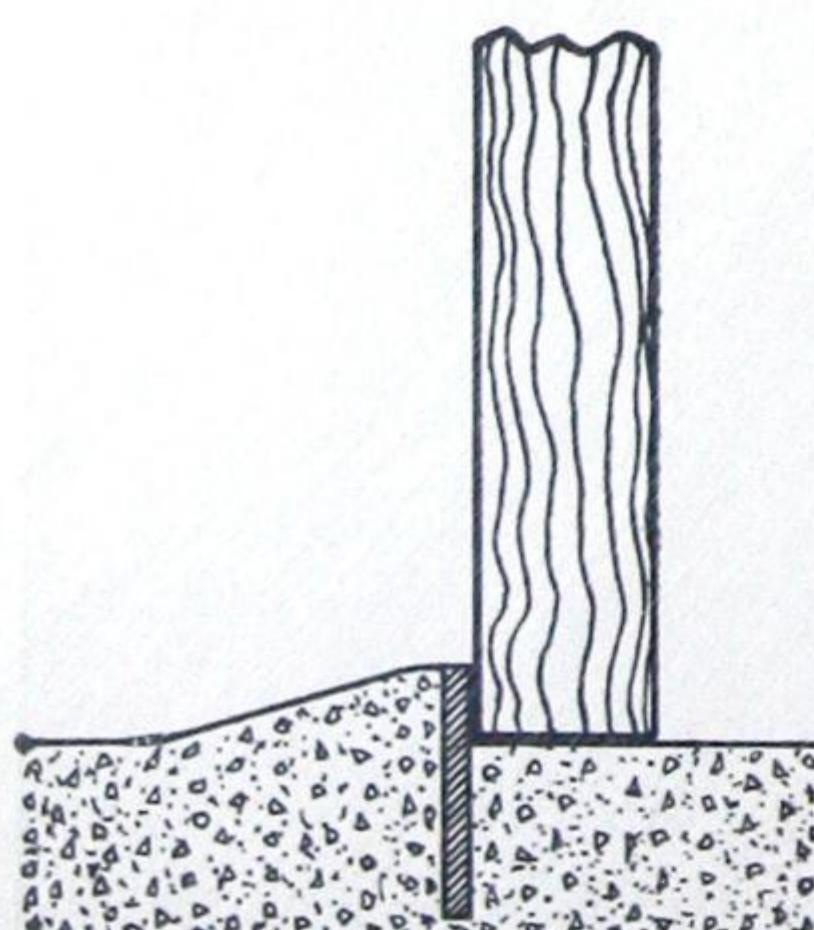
Concrete raised threshold with edge formed by flat steel bar set in concrete.
